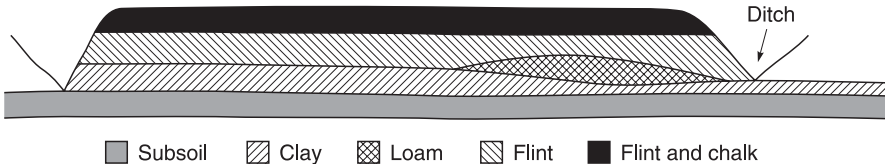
Construction of a Roman road. (Source: Margary, 1993.)
